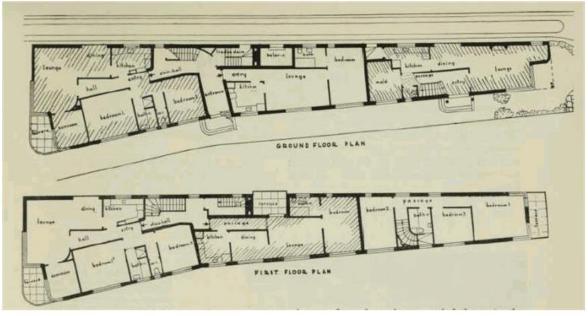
The building's floor plan shortly after completion as published in *Decoration and Glass*, Vol.15 No.2 (July-August 1949), p.25
